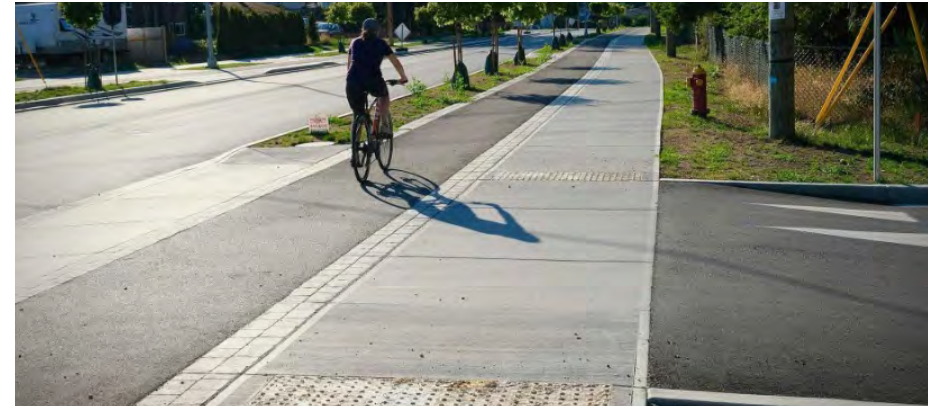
Continuous Side Street Crossing (Source: Nanaimo, BC)
